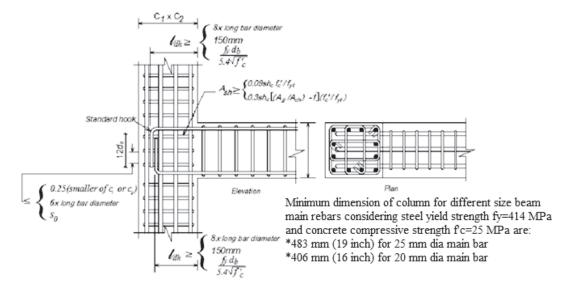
(a) Minimum Column Size Requirement for Exterior and Corner Column [Reference: Figure 6.8.15, Chapter 8, Part VI, BNBC 2020]
